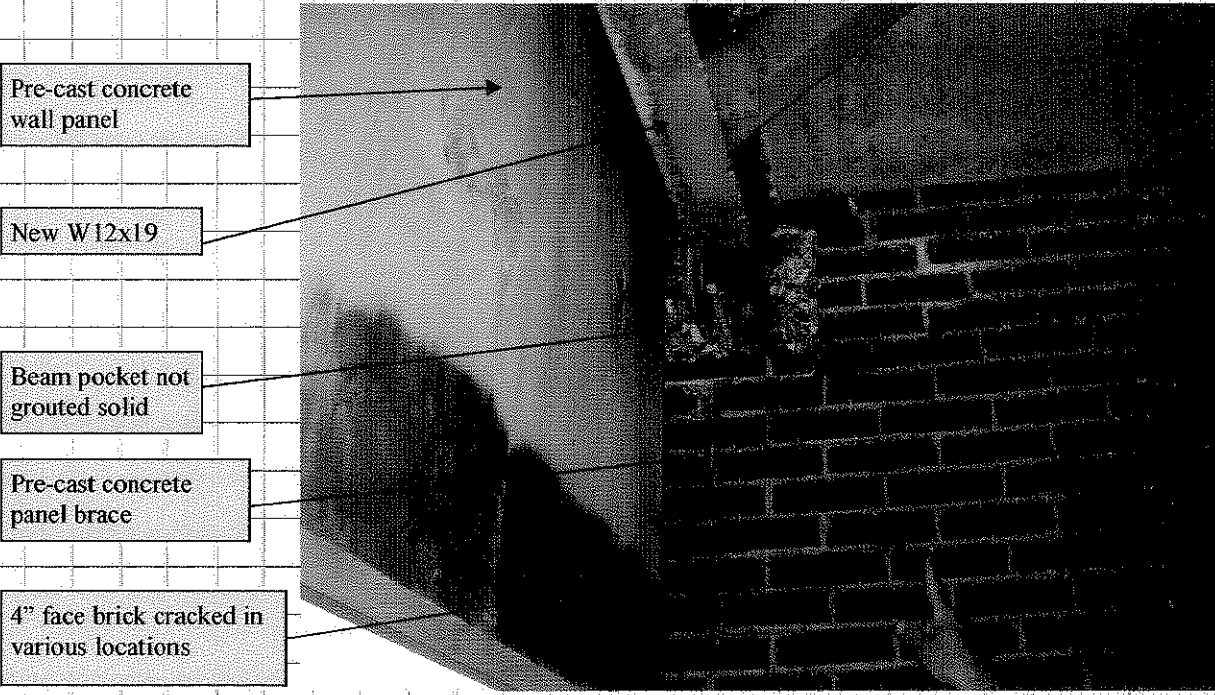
" thick pre-cast concrete floor panel to steel beam
